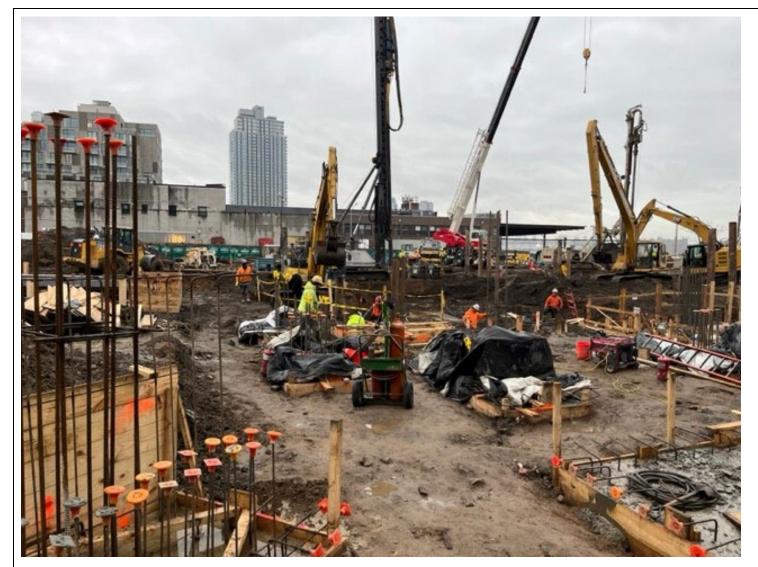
View facing south, CCJV & Atlantic Reinforcing installing foundation elements in grid cells SC-8 and SC-9.
